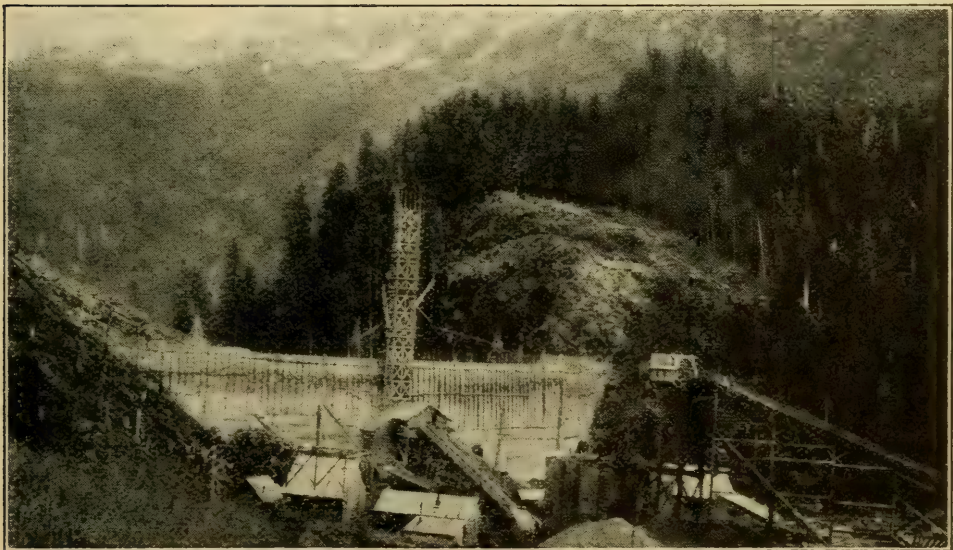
SALMON CREEK DAM. CONSTRUCTION PLANT.
